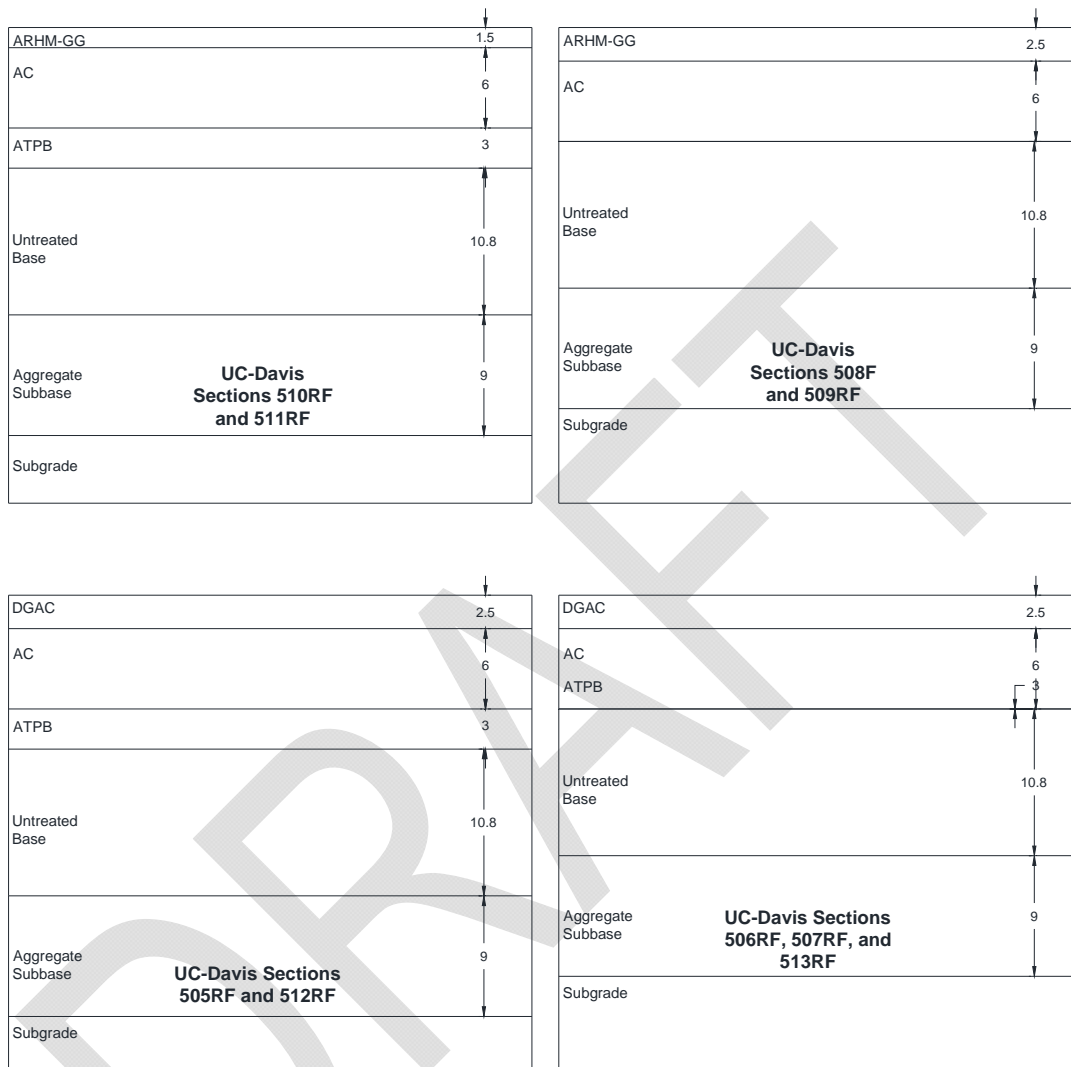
Profile view of pavement structure UC-Davis Sections.
